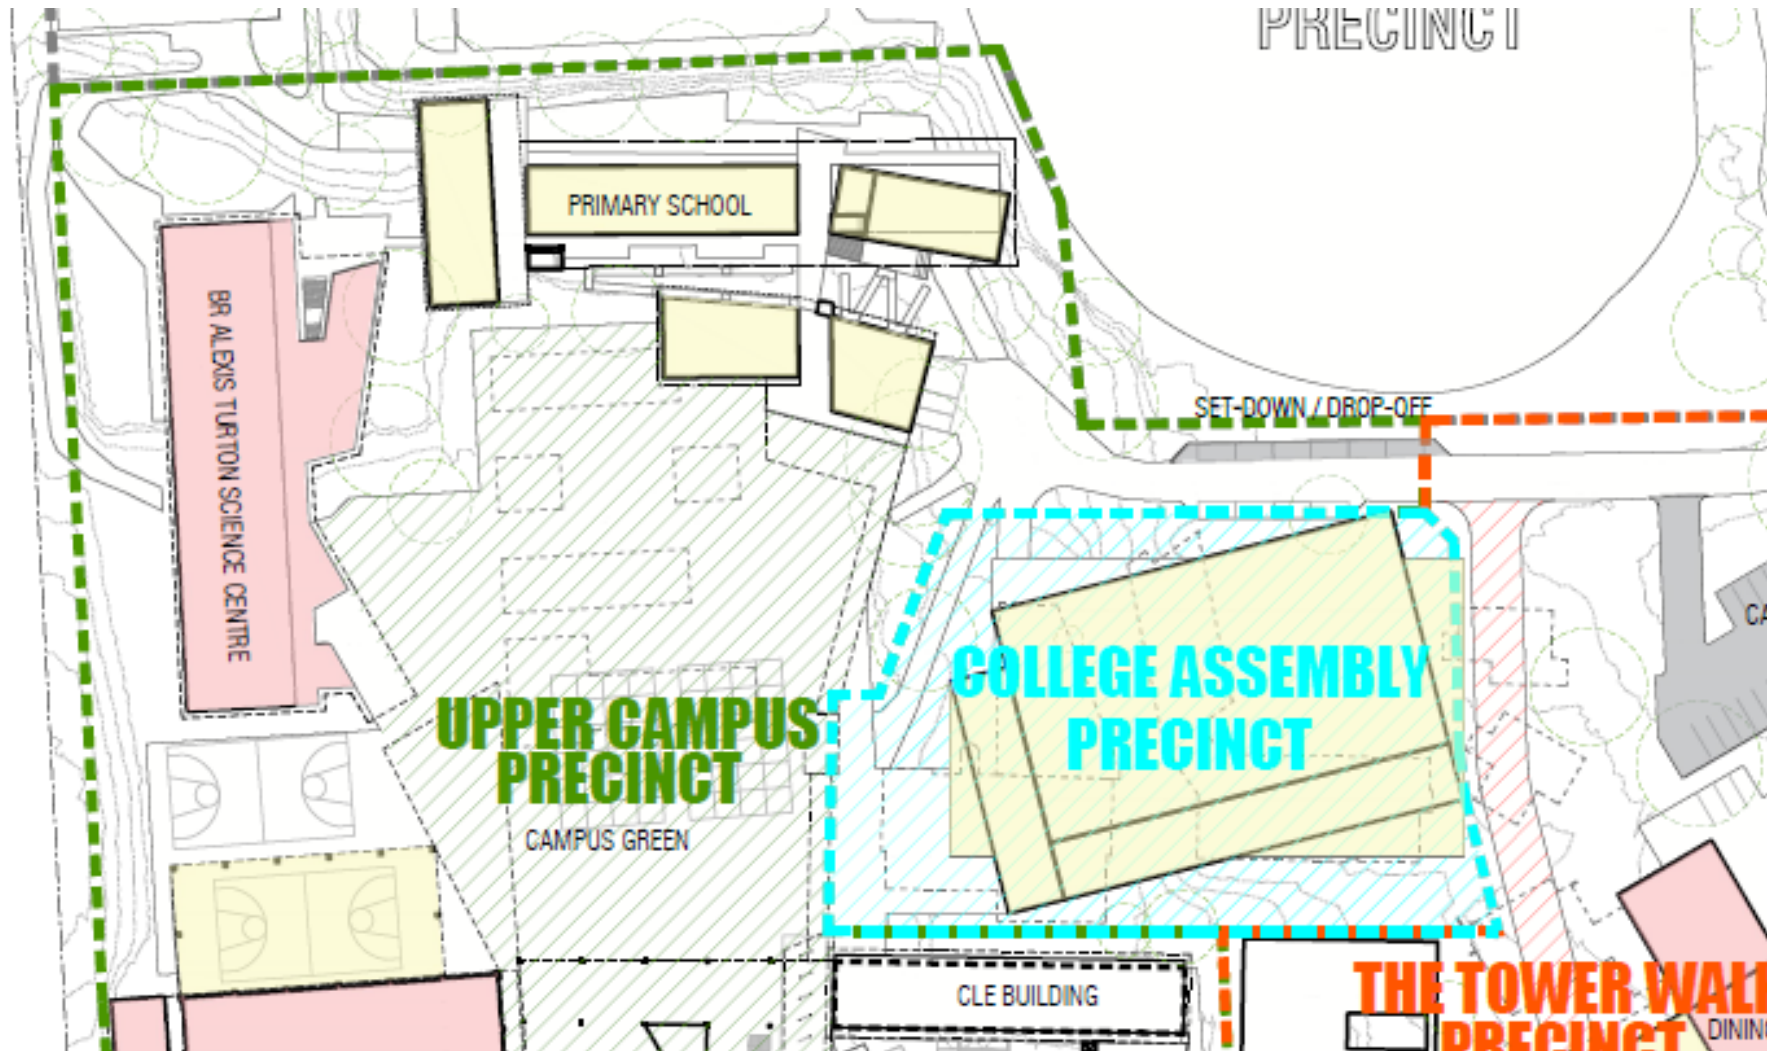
Extract from Site Plan where proposed Primary School and College Assembly precincts are being proposed
